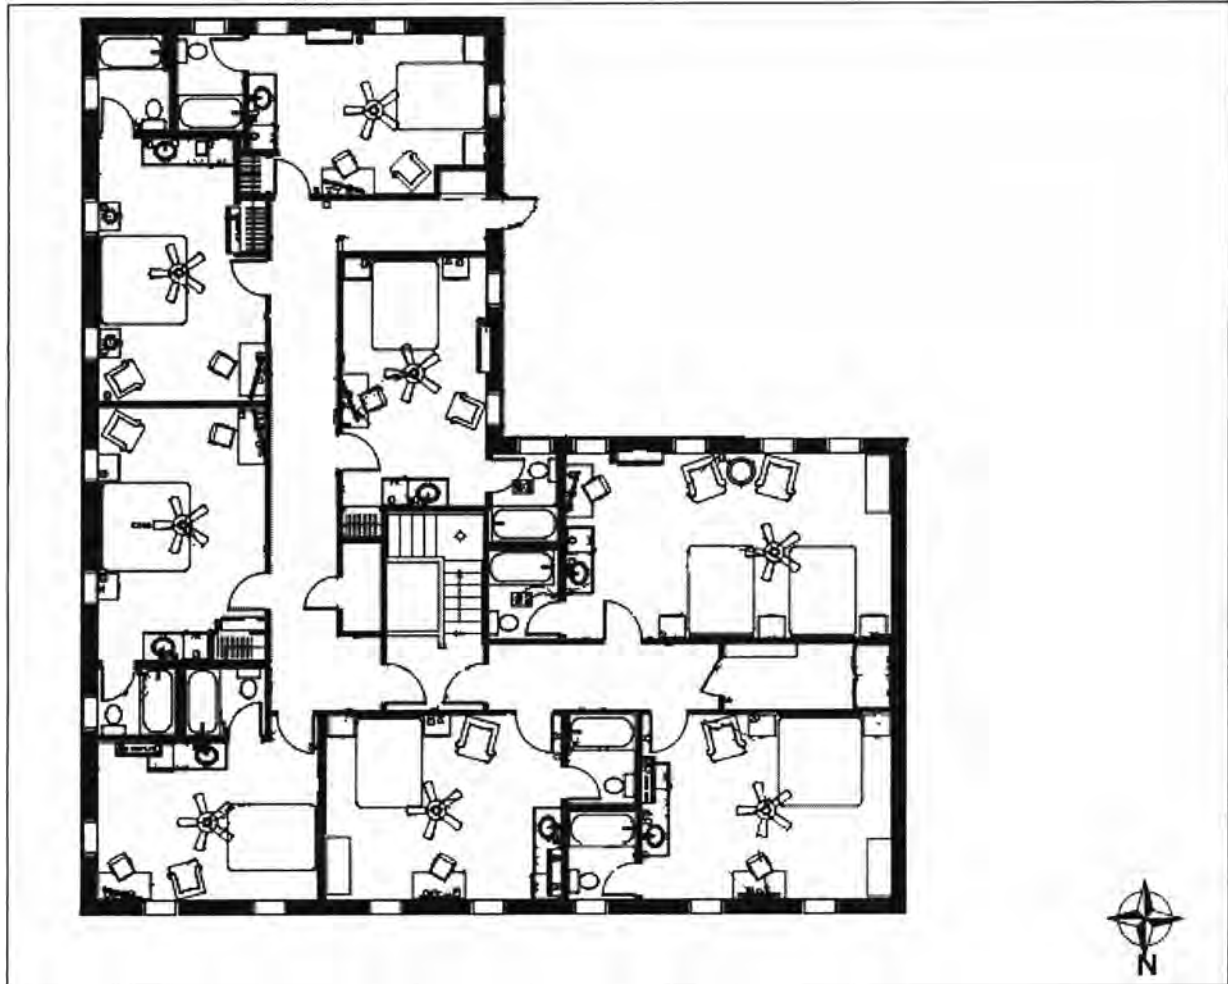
Current third floor plan (TBE Architects & Design, Inc., 2011)
